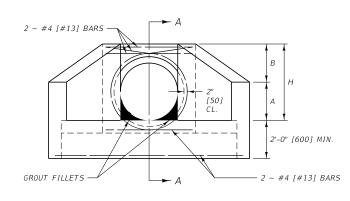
DETAILED DRAWING REFERENCE DWG. NO. STANDARD SPEC. SECTION 613, 707 613-10
